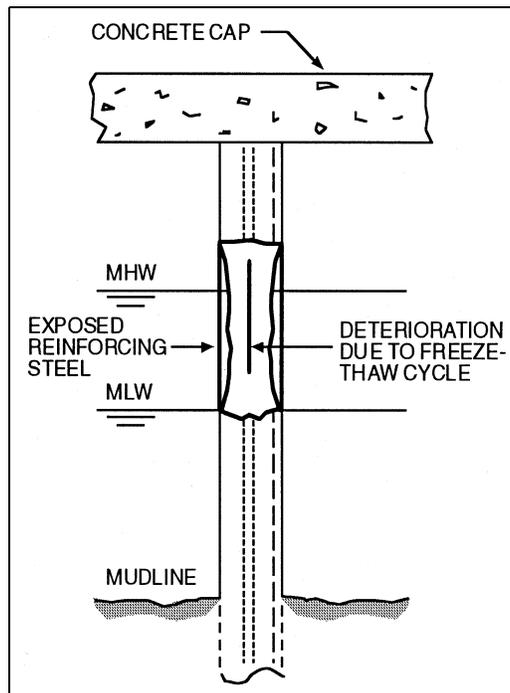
Loss of Concrete Cross Section Due to Freeze/Thaw Cycle.
